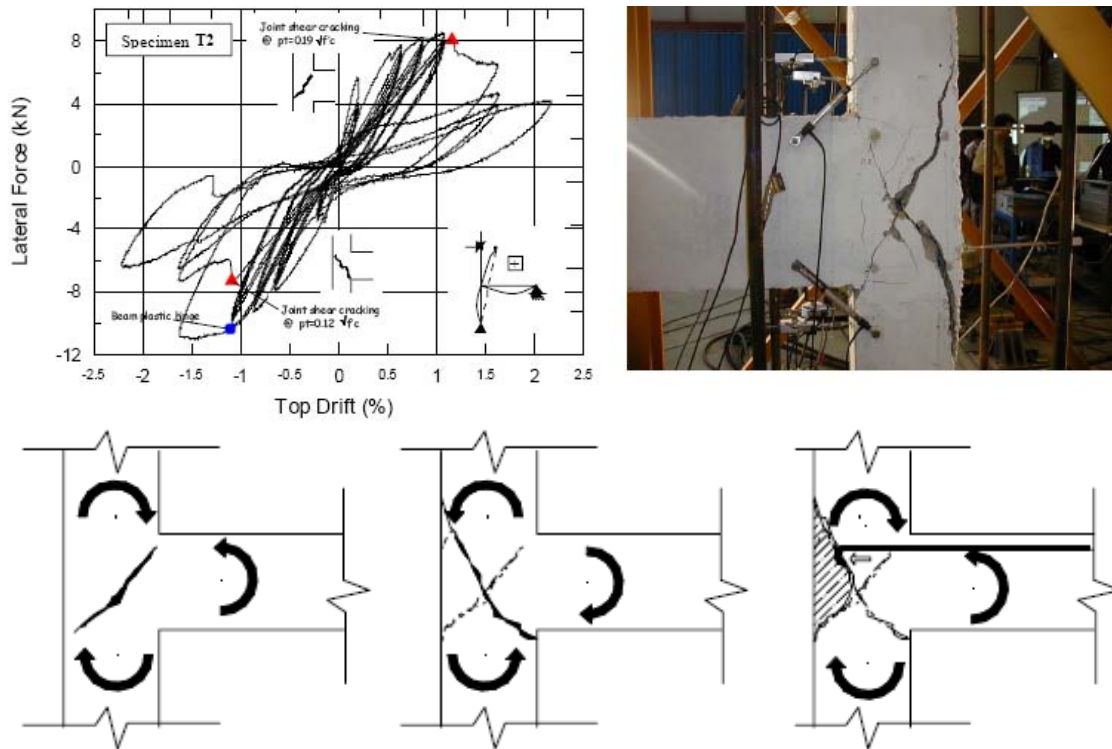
Exterior beam-column joints with no stirrups, double-180° beam anchorage and plain round reinforcement: top) Force-displacement plot and final damage pattern for T2 exterior joint; bottom) Progression of damage for ‘concrete wedge’ failure of exterior beam-column joints [177].
